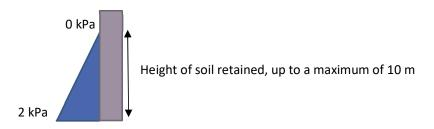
PRESSURE PROFILE TO ADOPT IN DESIGN OF SOIL RETAINING WALLS FOR EXCEPTIONAL LOAD CONDITION (GROUNDWATER) REPRESENTING BLOCKED DRAINAGE
